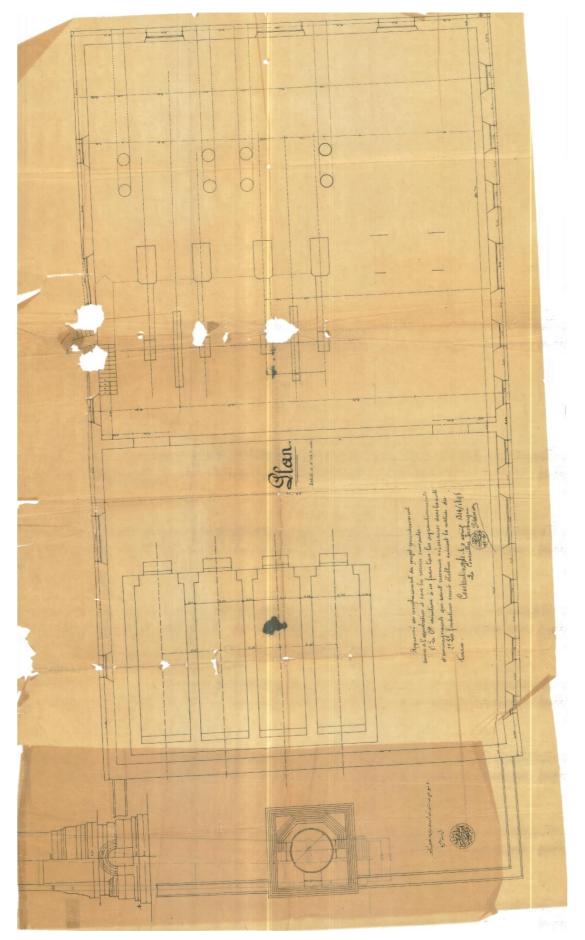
Figure A. 9. Original Plan in 1898 of Halkapınar Water Pump Station (İZSU Archive)
